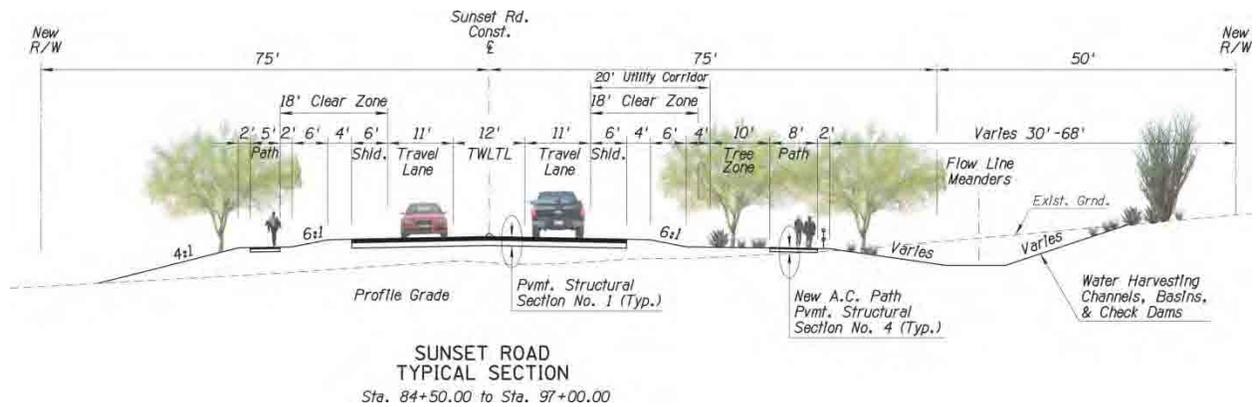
Sunset Road typical section with water harvesting channel on south side
